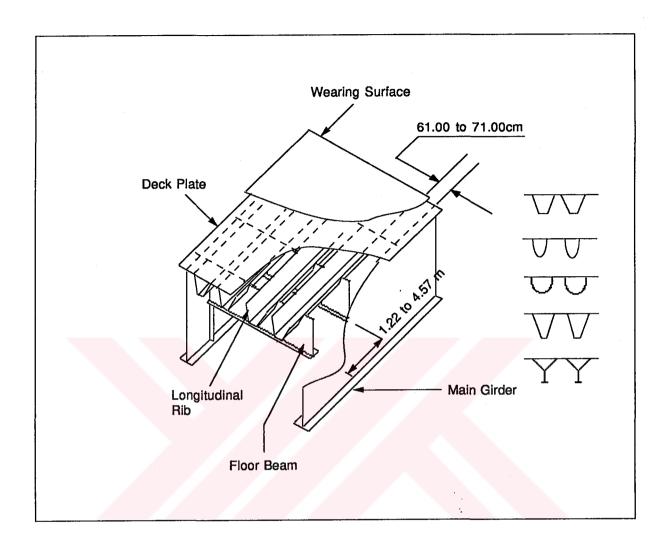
ORTOHOTROPIC DECK BRIDGES; CLOSED RIBS
